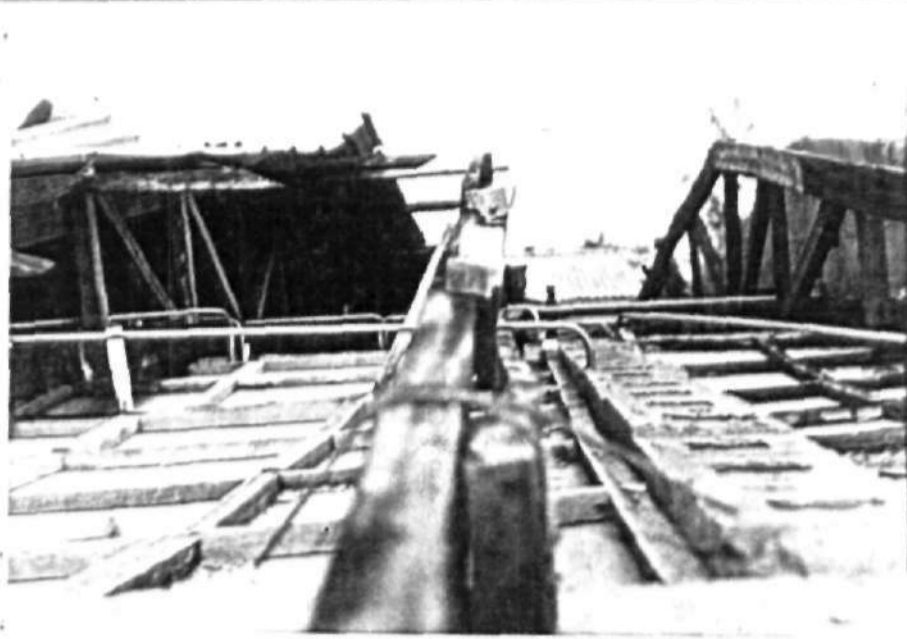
Roof blown off by wind - ceiling and electrical works affected
